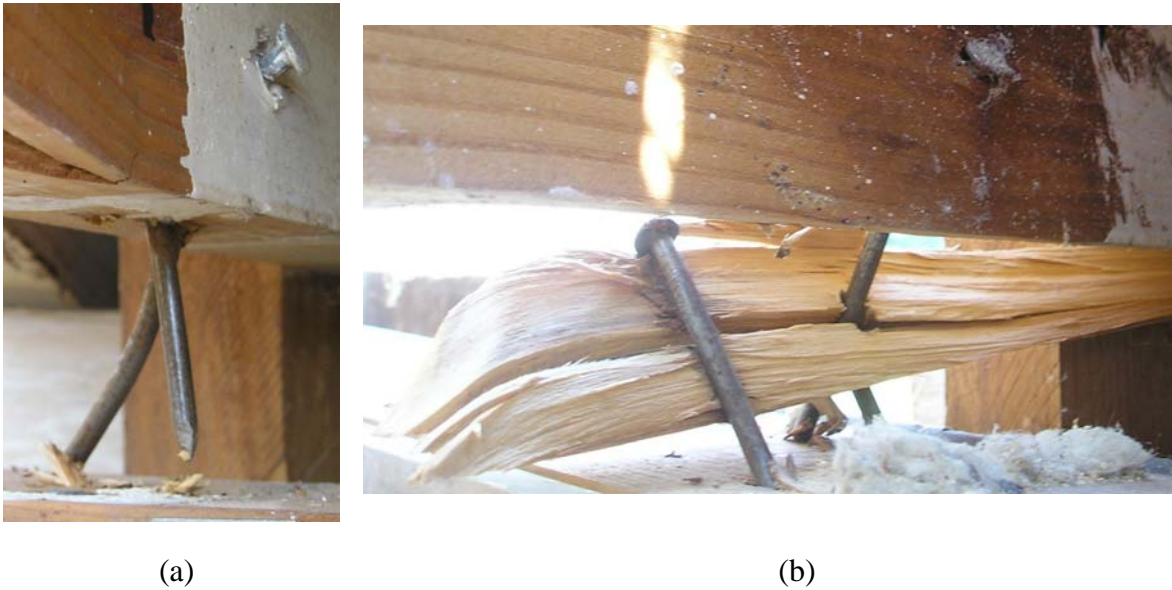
FAILURES BY (A) NAIL WITHDRAWAL AND (B) WOOD SPLIT
